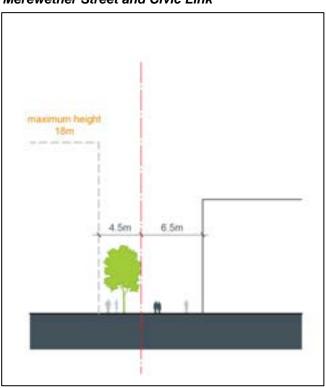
New accessway way between Merewether Street and Civic Link
